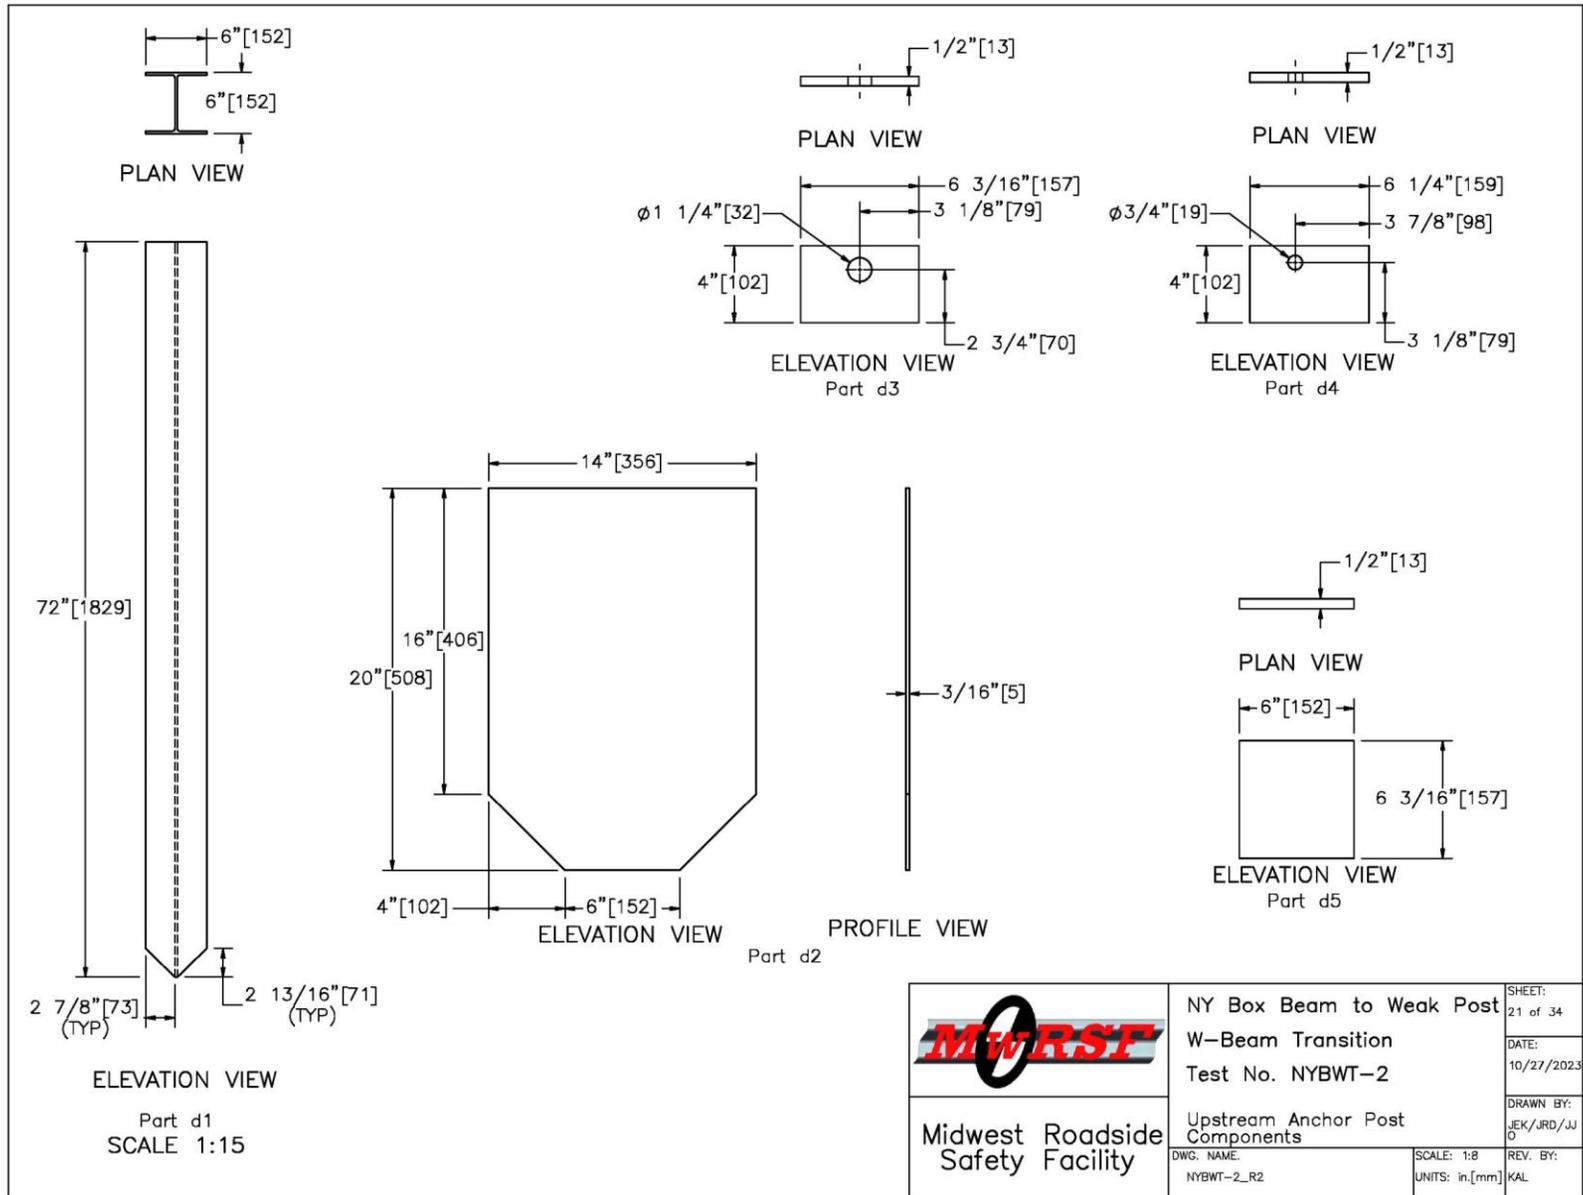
HFT Anchor Assembly Components, Test No. NYBWT-2
